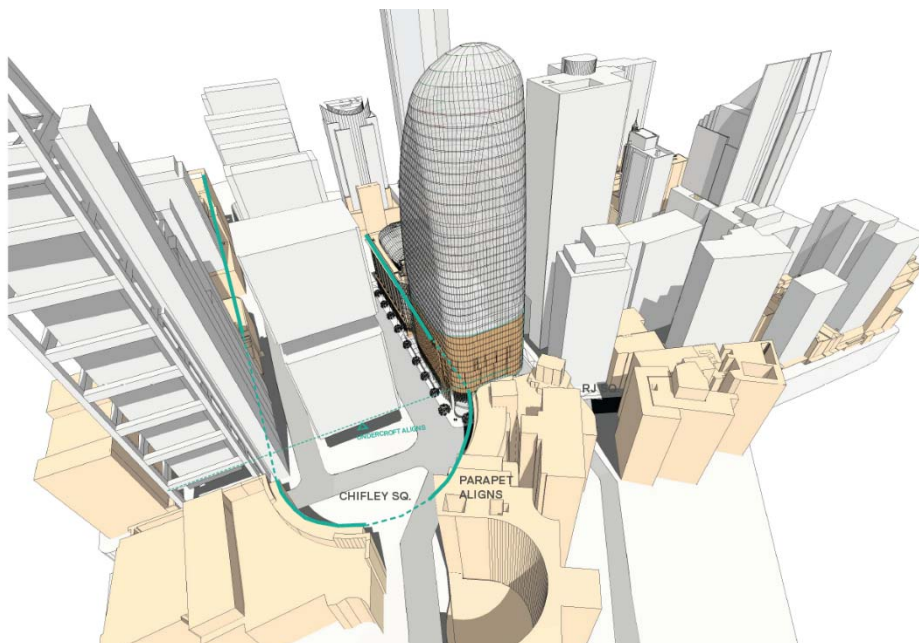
3D impression of podium form and materials reinforcing the adjacent building key parapet and undercroft heights
